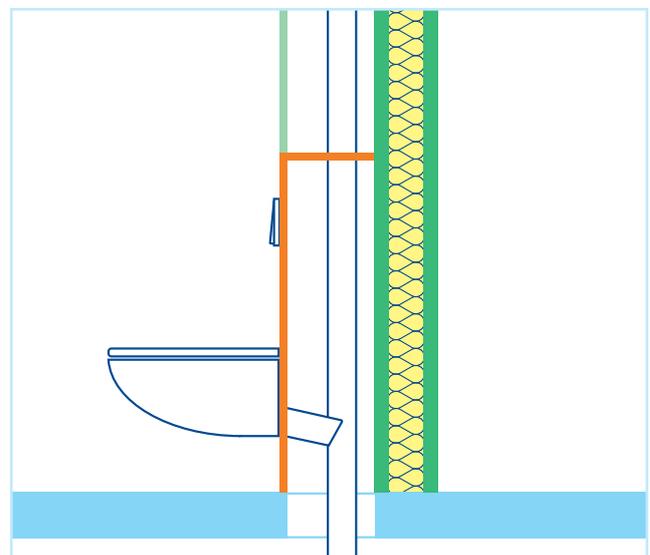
Drywall curtain wall in front of solid wall (based on source 8)
